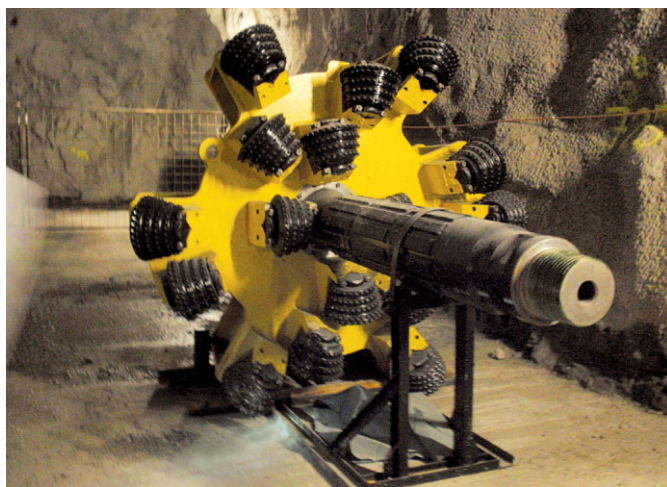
Raise boring head used for the vertical pressure shaft of the pumped storage station at Nant de Drance (Photo: Schleiss, Sept. 2012)
